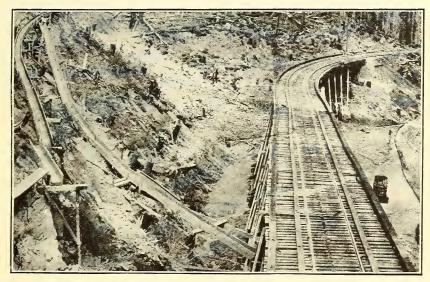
Bridge No. 183, Northern Pacific Railway, Showing Lower Slope and Retaining Levee, Also Flumes for Carrying Materials to Embankment.
